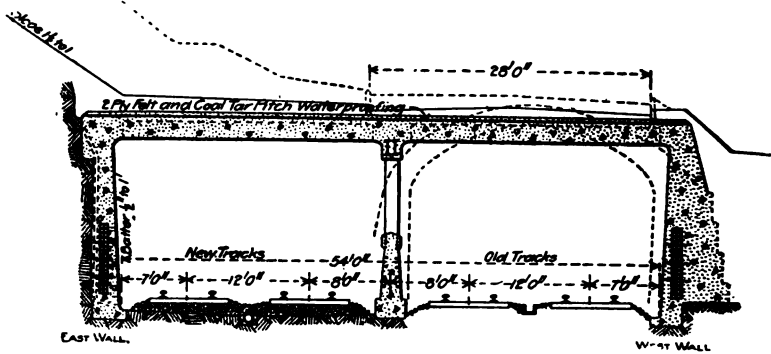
Cross-Section of Ossining Tunnel, N. Y. C. & H. R. R. R.
